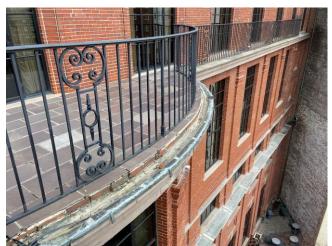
Slippery and loose pavers pose potential tripping hazards and non-original railing at fifth-floor does not comply with current architectural or structural code.
